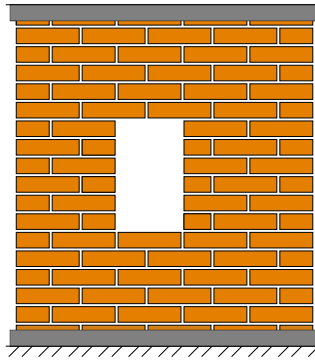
Geometry of the shear wall with openings of the TU Eindhoven
